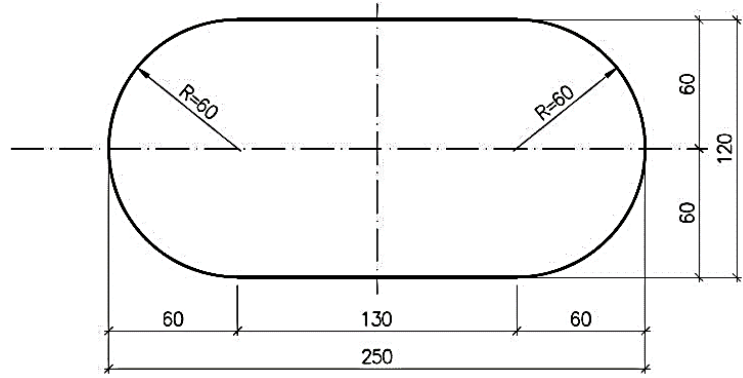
Cross Section of the Piers of Balıklı Bridge (in cm)
